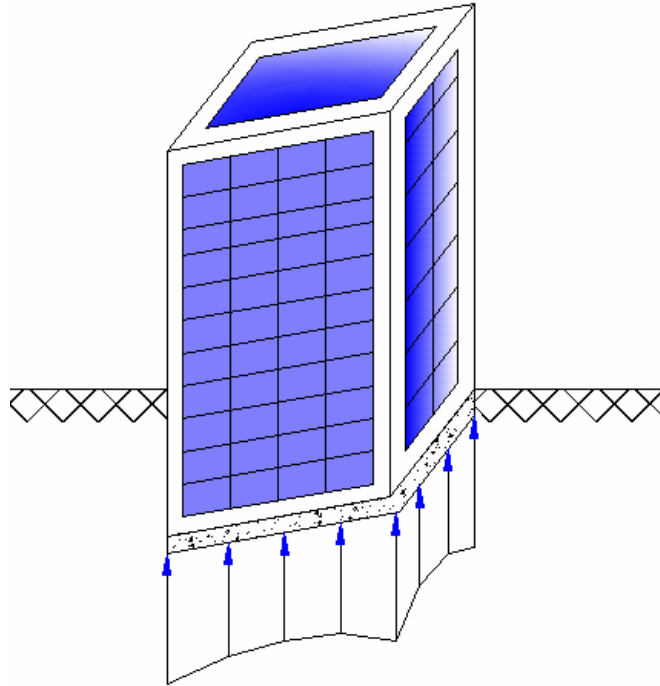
Flexible raft foundation supporting a multistorey structure
